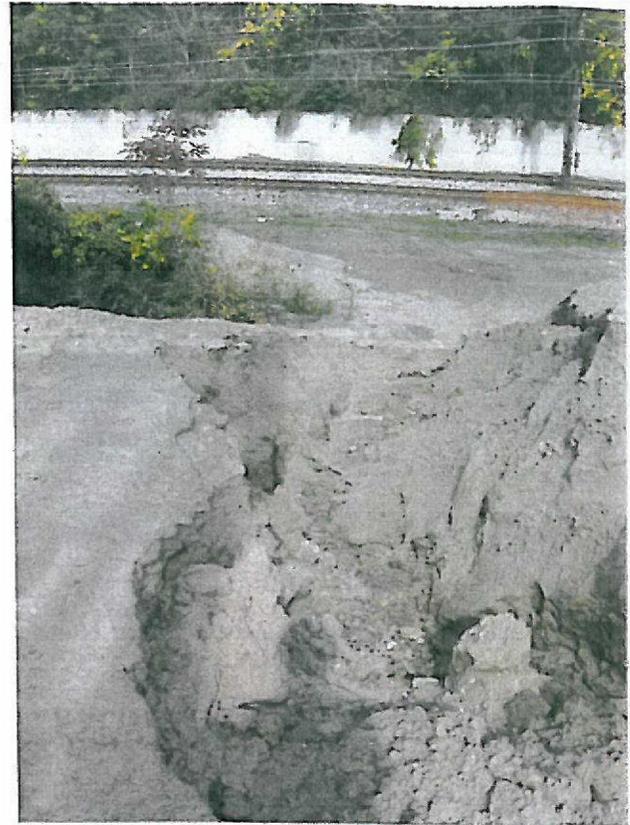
(RIGHT). An erosion gully has formed near the Bridge 13 abutment. Silt fence F-13 has not been installed at the base of the slope along the RTA tracks.
